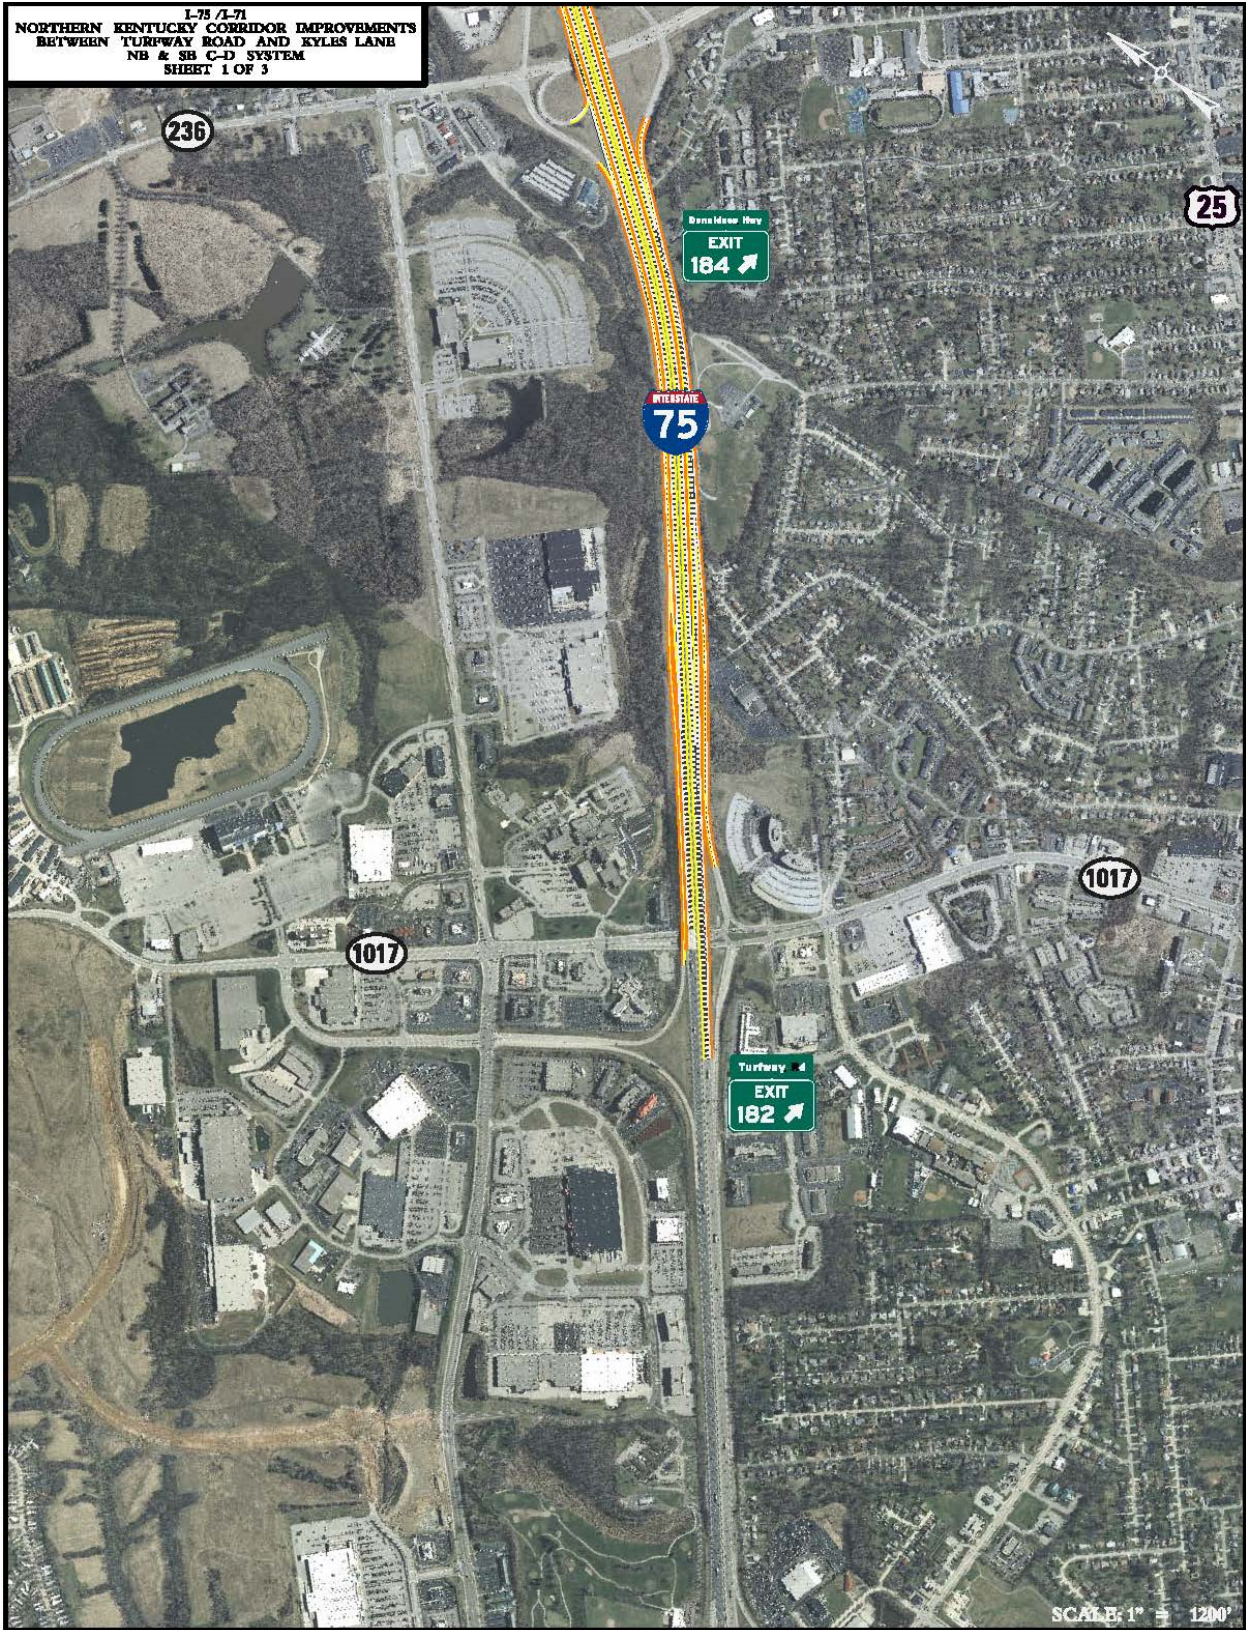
I-71/I-75 Collector-Distributor System – Turfway Road to Donaldson Road
